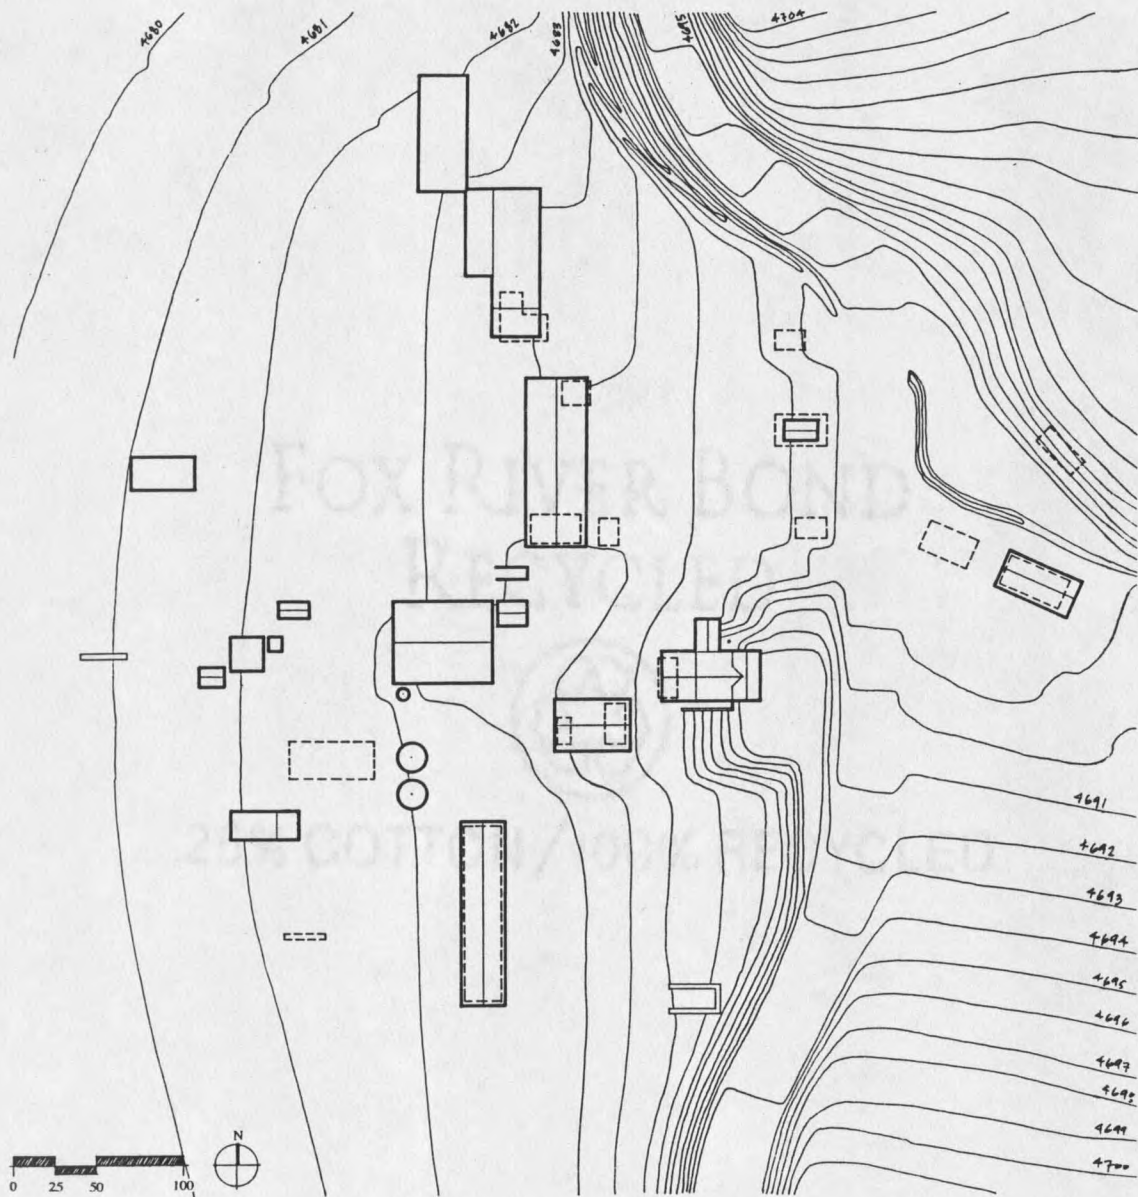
Site #1 - Topographical site plan illustrating the intermediate platform. (One foot interval between contour lines).
